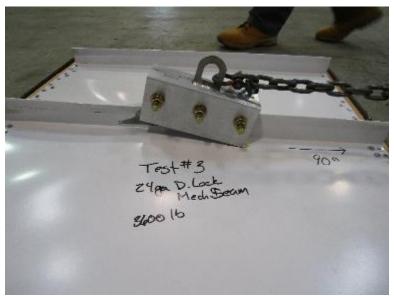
Specimen at 3,600 lbs. Parallel to Direction of Standing Seam Roof
